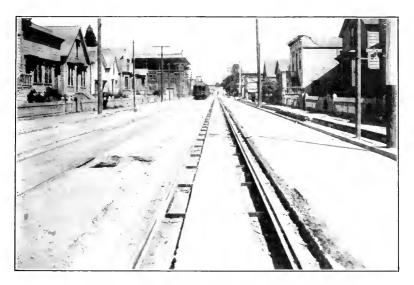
ASPHALT PAVING, TWENTY-SECOND STREET, OAKLAND, CAL. GIRDER-RAILS, STEEL TIE-PLATES, WOODEN TIES, CONCRETE TO BASE OF TIE, BASALT BLOCK LINERS ON 1^{10}_{2} -IN. SAND CUSHION.
